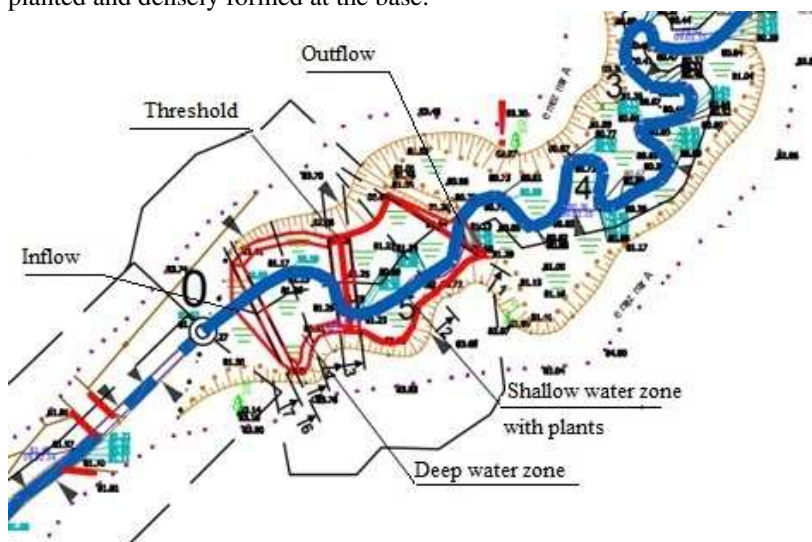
A plan of surface flow constructed wetlands in Zante
